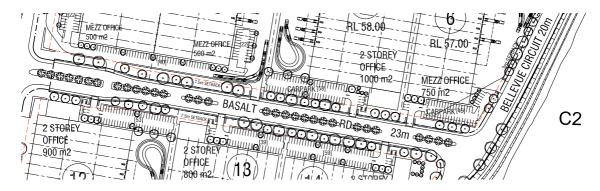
Basalt Road – As Approved (Source: Approved Plan MP08.05, Masterplan Lot B)
